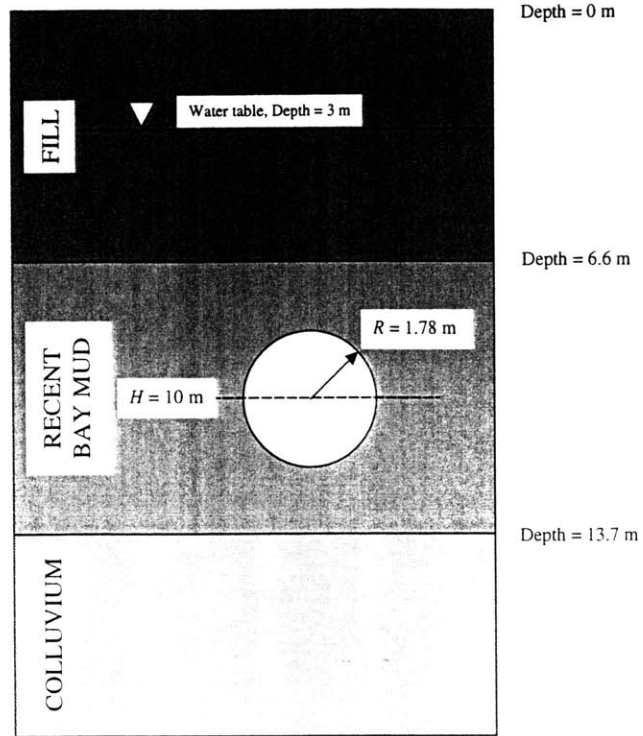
Case 4: N-2 Contract tunnel – Cross section
